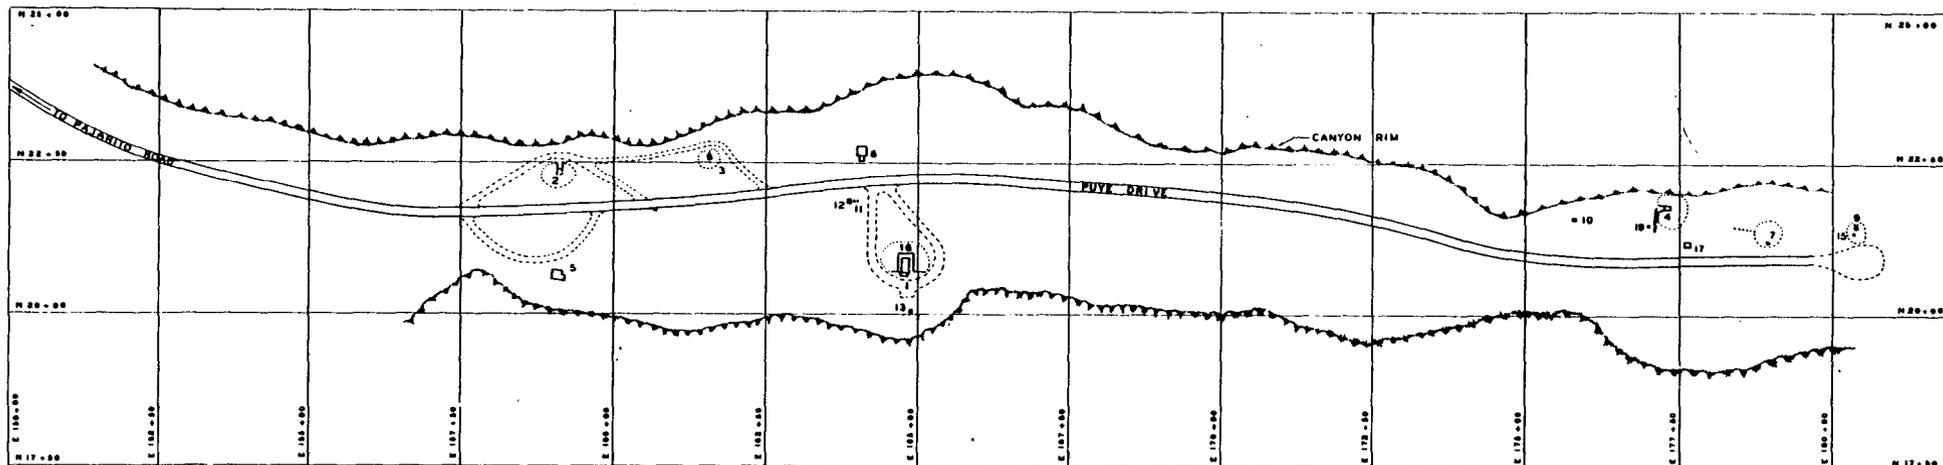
Structure Location Plan for TA-5 - Beta-Site
